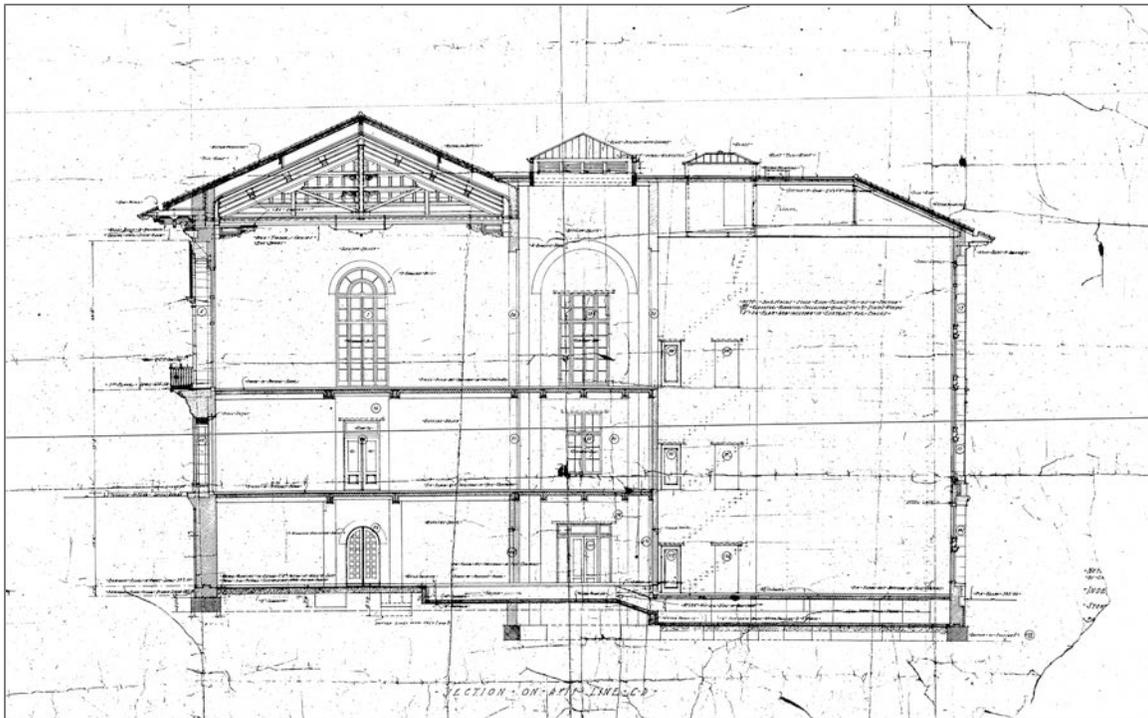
Section through Battle Hall showing central ventilating skylight and secondary skylight over elevator shaft
